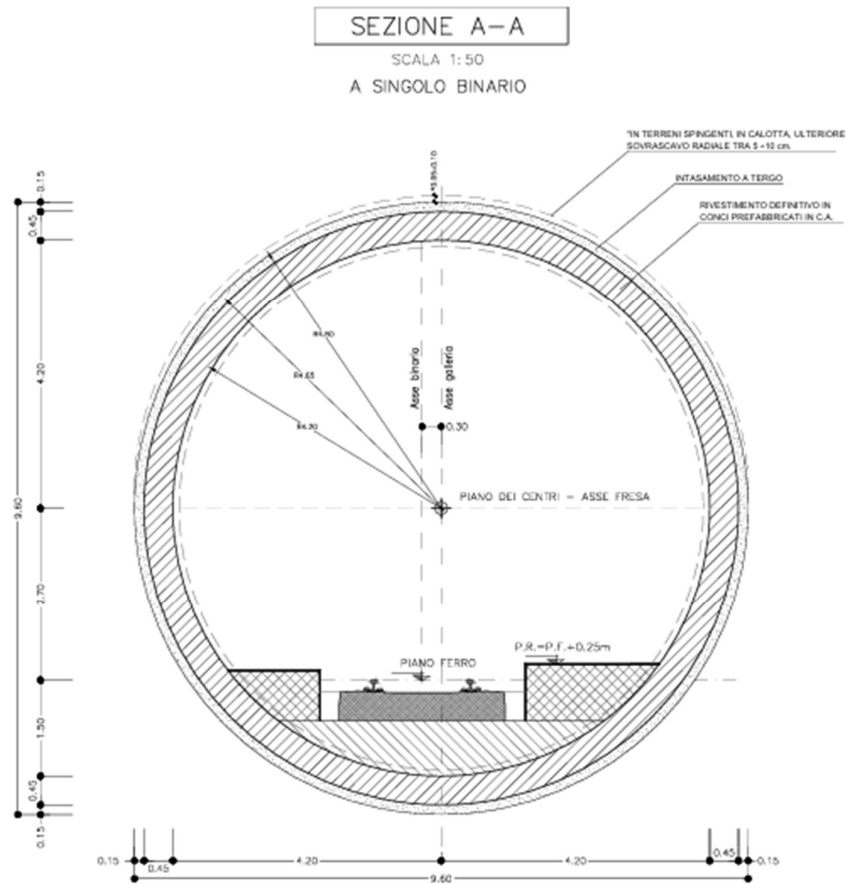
Cross section of the Trento ring road tunnel (Italferr, 2021)
